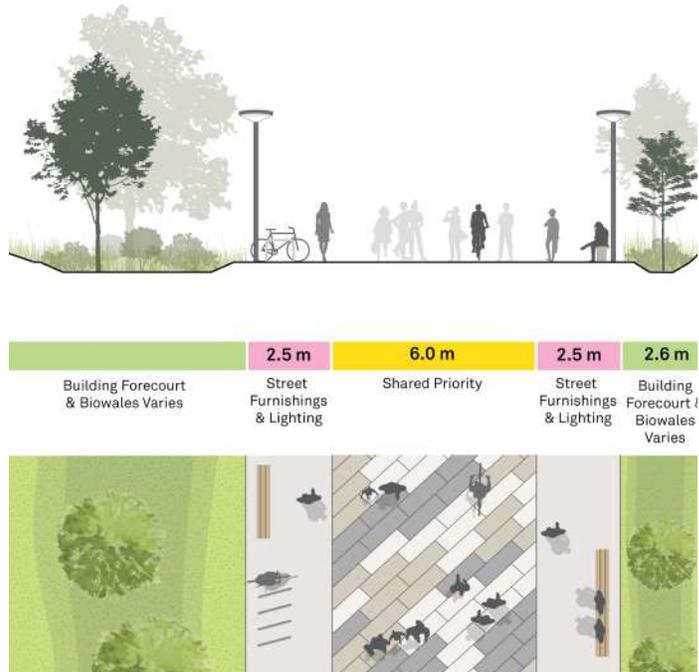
Section H. Proposed condition of Engineering Service Lanes between DC and E3.
